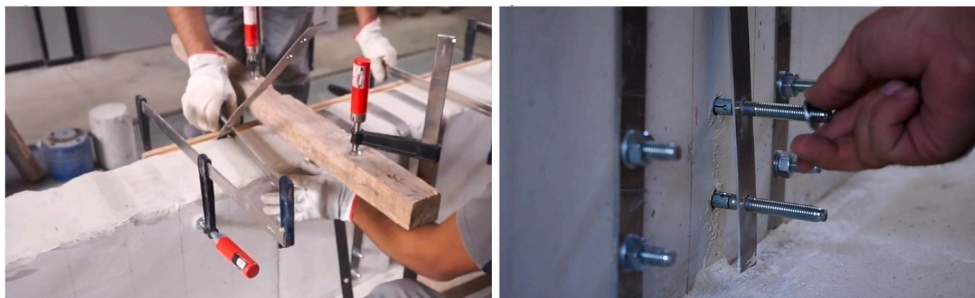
Shear strengthening of a T-beam with Fe-SMA strips: (a) prestrained strips placed on the beam web and (b) anchorage using mechanical fasteners [58-Elsevier Copyright].
